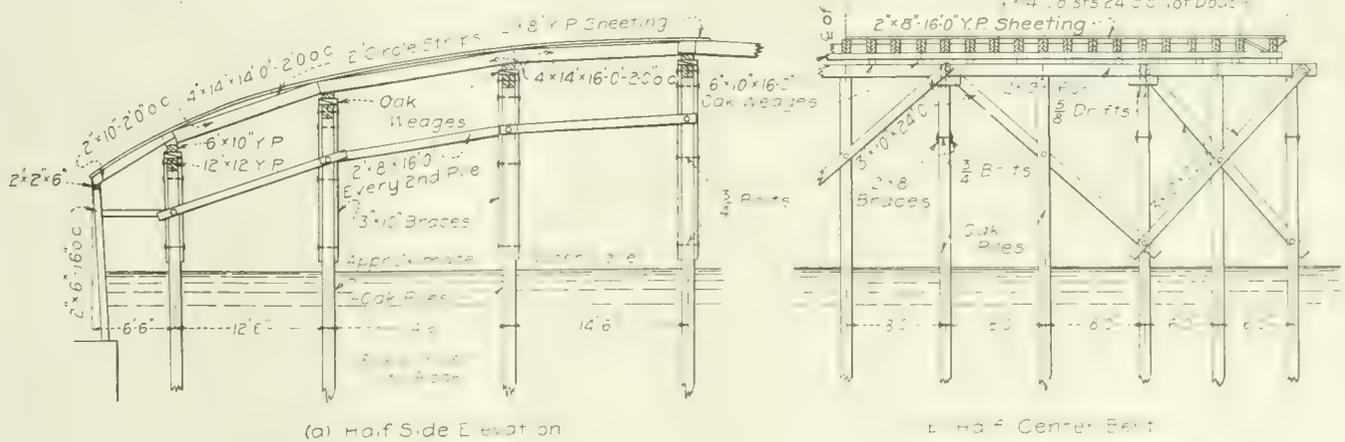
Half Side Elevation and Half Cross-section of Centering Showing Center Bent for Reinforced Concrete Arches at Third Ave. Cedar Rapids, Iowa.
